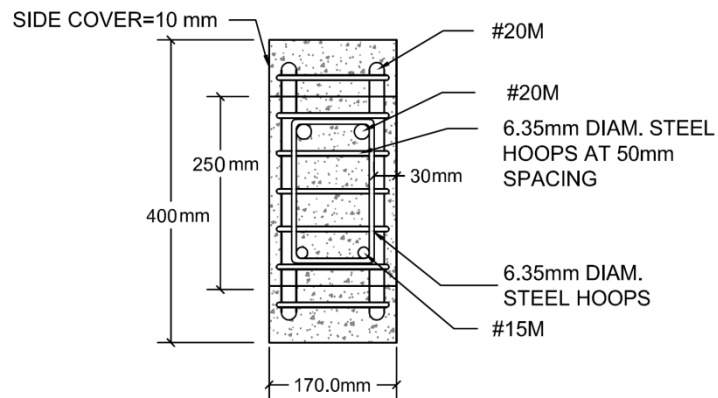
Typical cross-section showing details of beam and the middle block (Section B-B)
